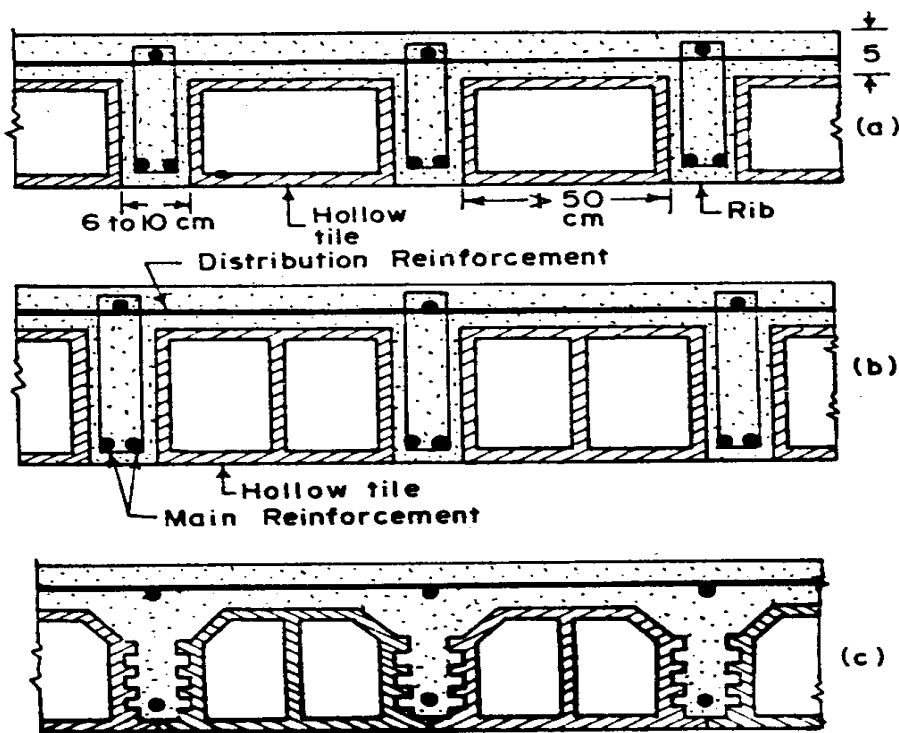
FIG. HOLLOW TILE AND CLOSE-RIBBED FLOOR
